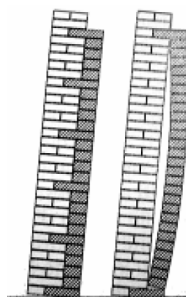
Different configuration of cladding connections and possible failures (Carocci et al. 2004).
